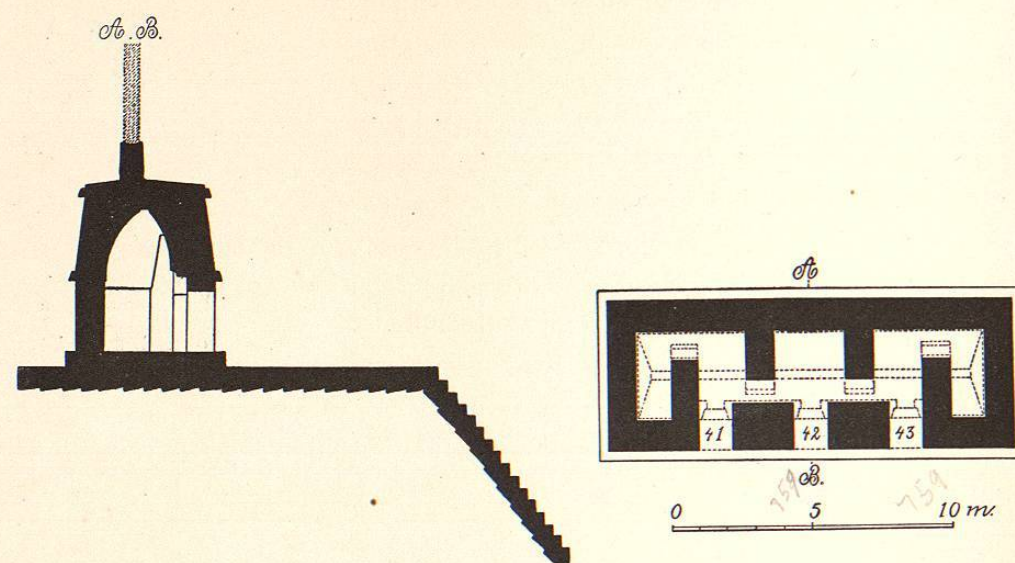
STRUCTURE 42: SECTION AND GROUND-PLAN (RESTORED).
